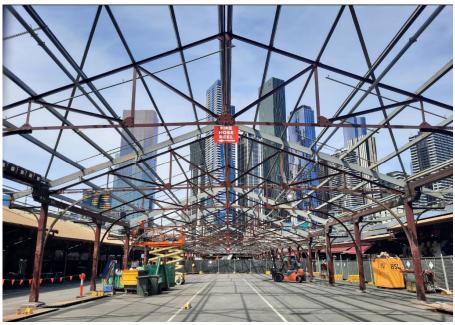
Shed D, looking towards Queen Street from Peel Street end with the site prepared for the installation of new thermal roofing.
